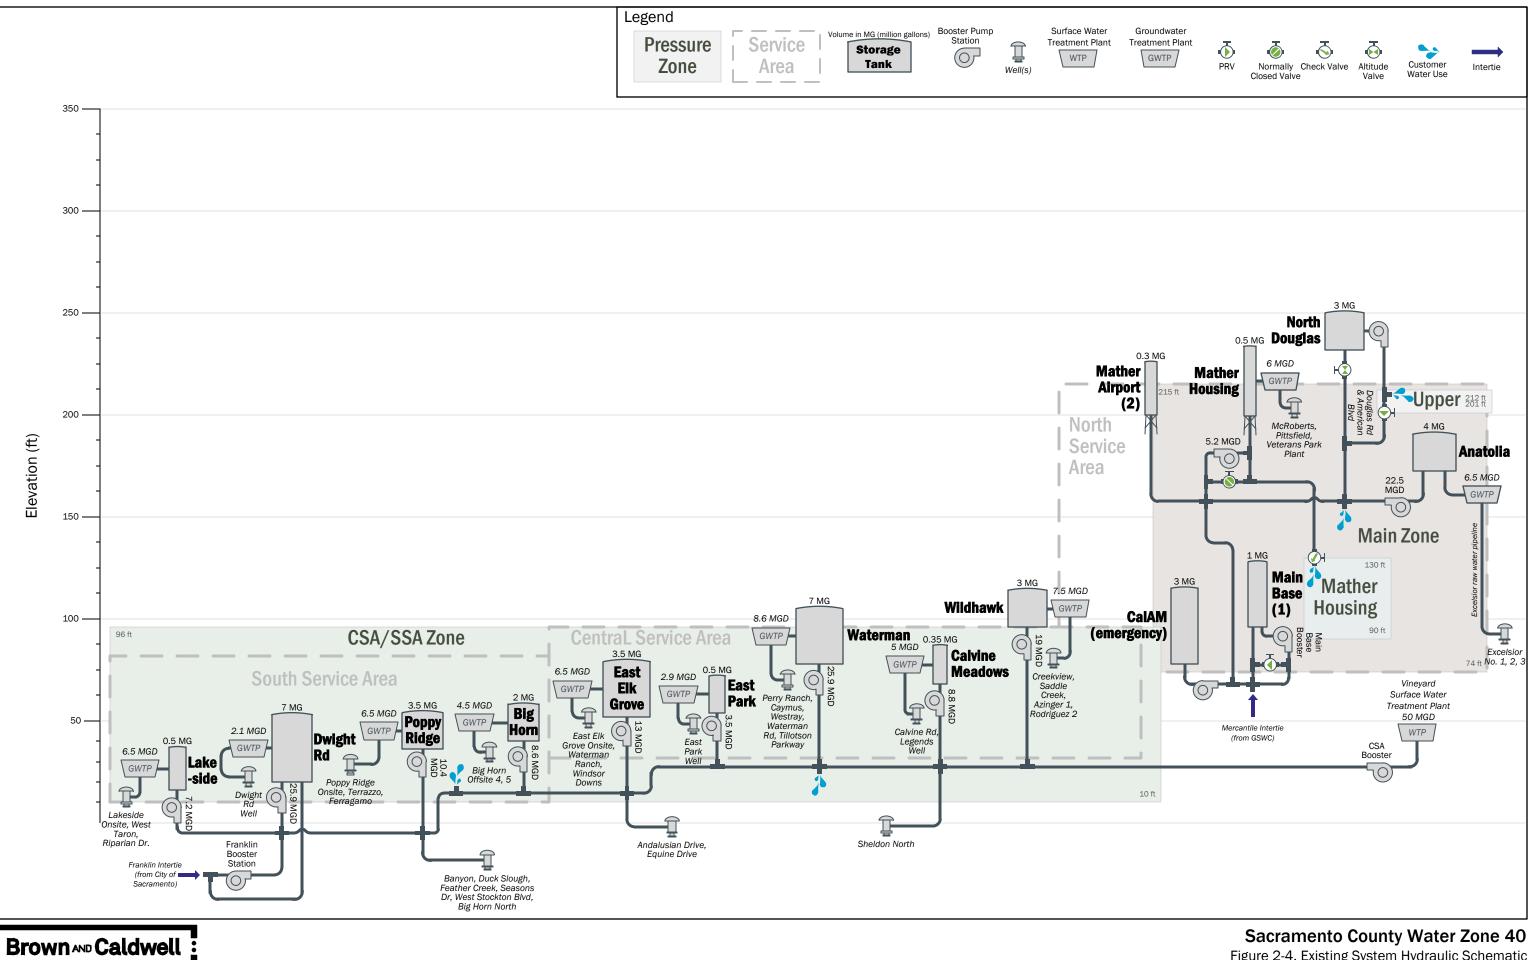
Existing System Hydraulic Schematic SCWA-7
